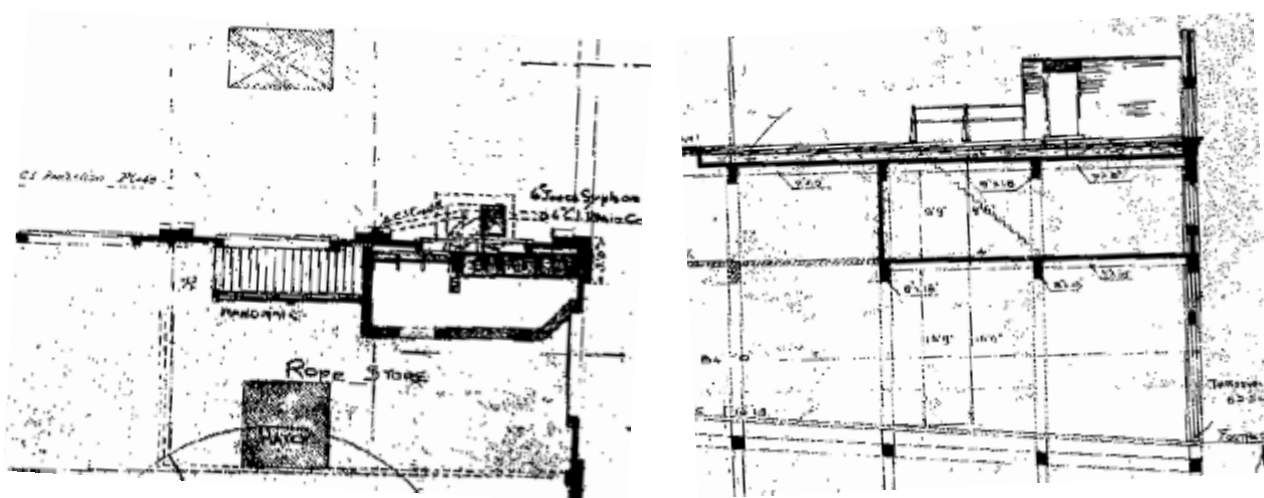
detail of 1907 plan of the warehouse upper floor, showing stairs from the Linking Building and structure at NE corner, NER ref 271
